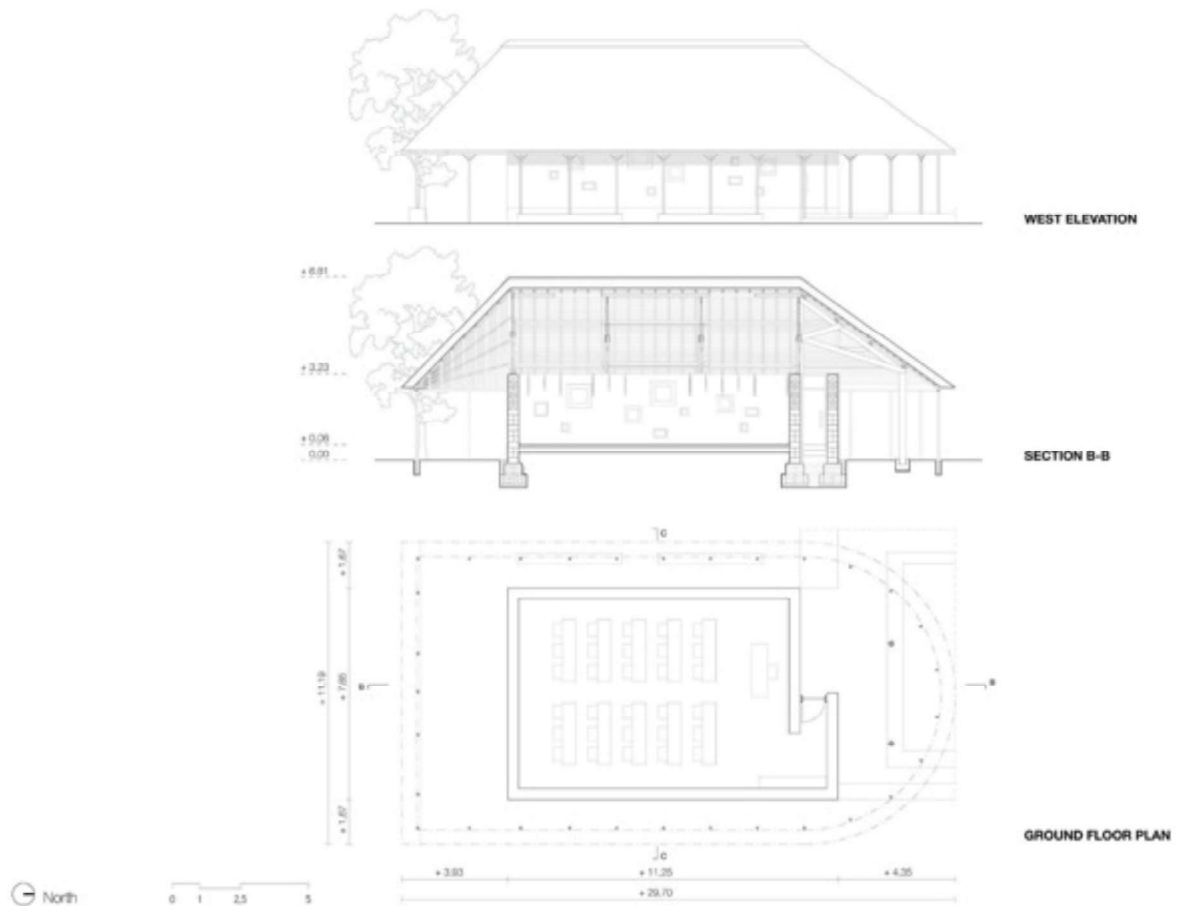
West elevation, longitudinal section, and ground floor plan of the third classroom
